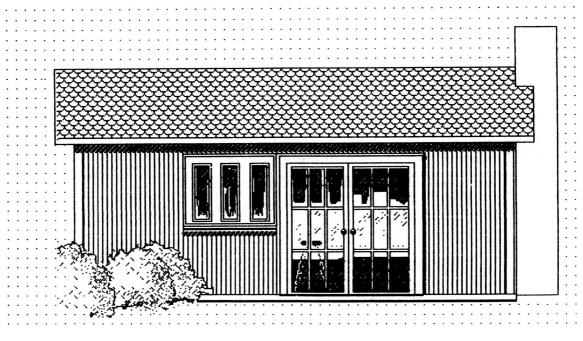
Elevation filled in with PATTERN to add impression of shadows and building material.
